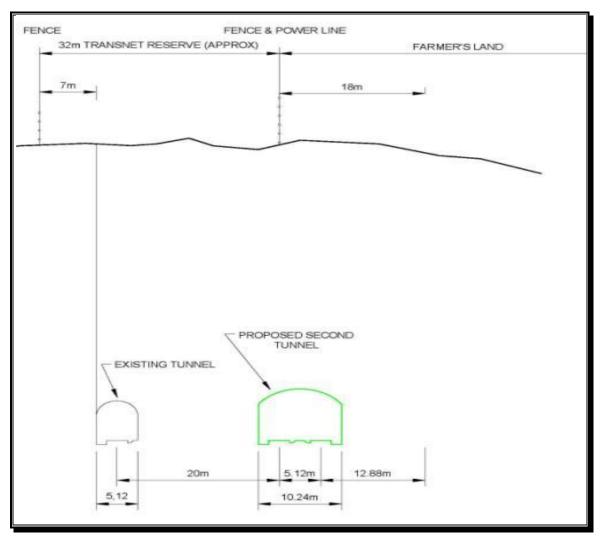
VIEW OF THE EXISTING SINGLE TRACK AND PROPOSED DOUBLE TRACK TUNNELS
